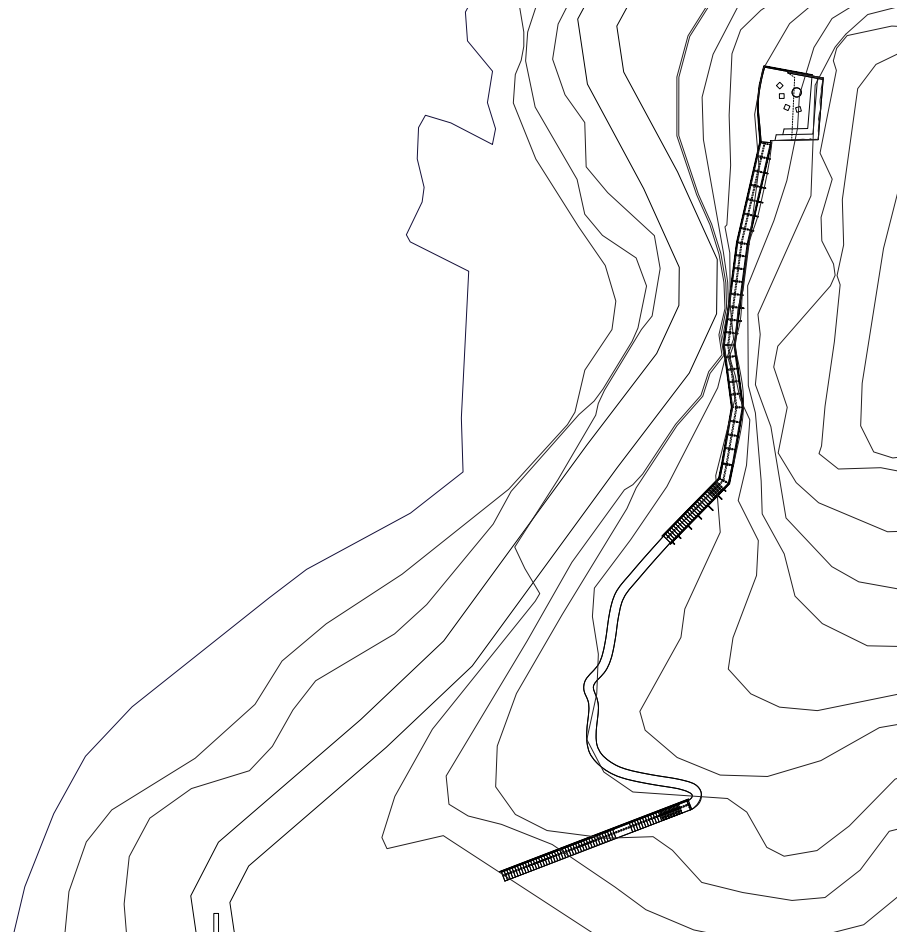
Plan – Kleivodden: stairs, cliff bridge, and cave shelter.
